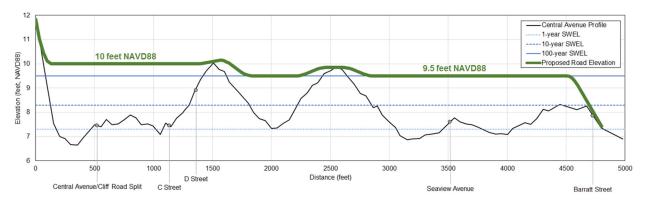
Existing road elevation (black) and proposed road elevation (green) along Cliff Road South and Central Avenue.
